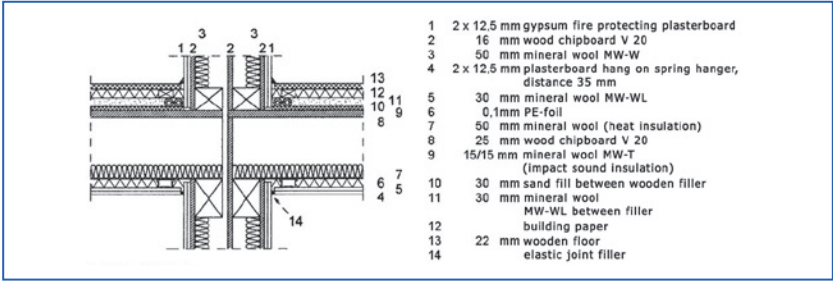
Connection between wall separating flats and floor (vertical section) [[2] - (Austria)].
